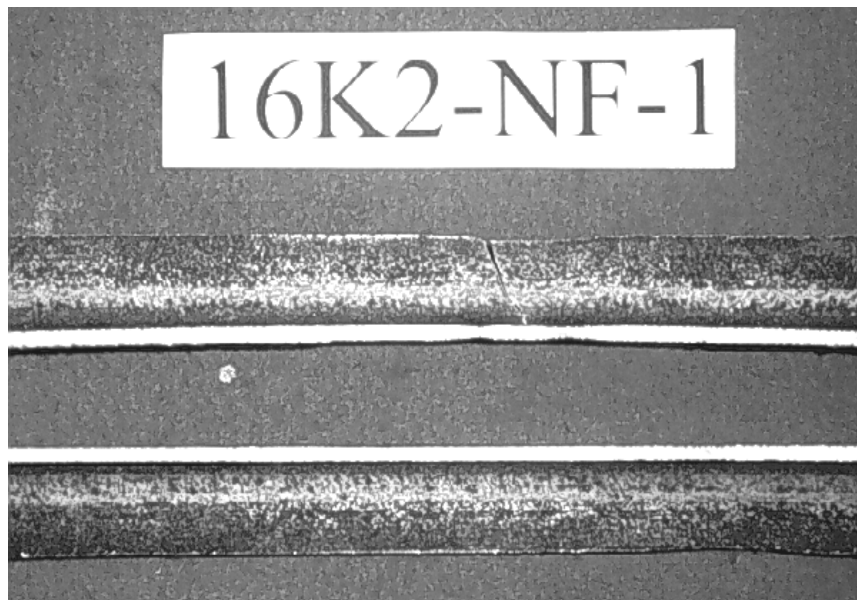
Failures in 16K2 Specimens with No Fasteners
